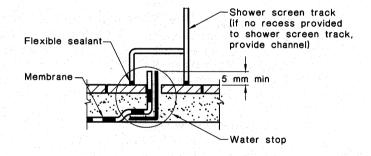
TYPICAL HOBLESS CONSTRUCTION
